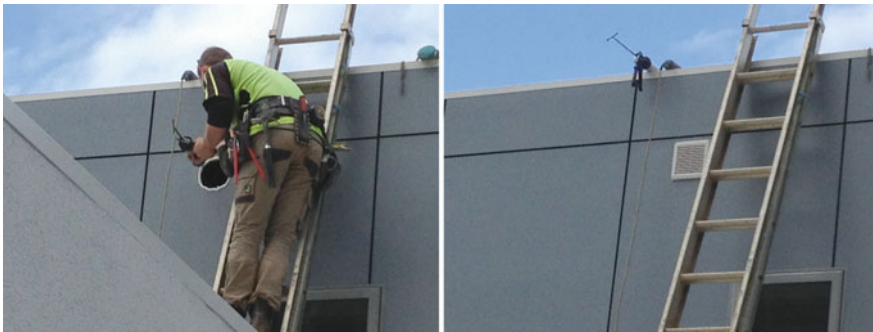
Installation of roof ventilation, in total 4 of these vents were installed
